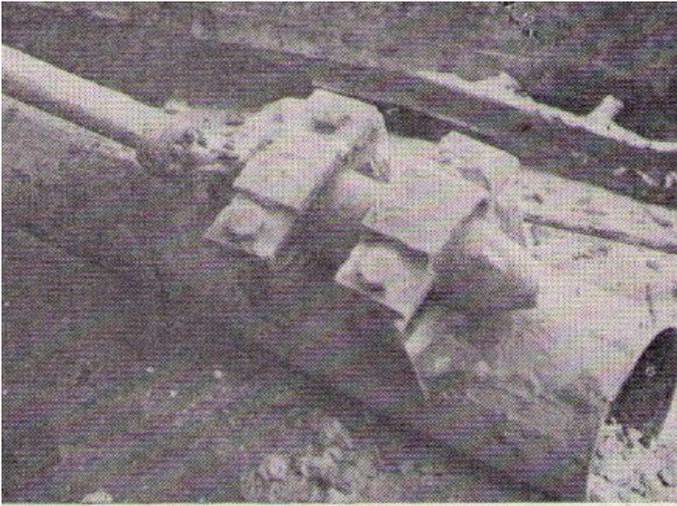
Equipped with a vibro bullet bottom concrete pipe
